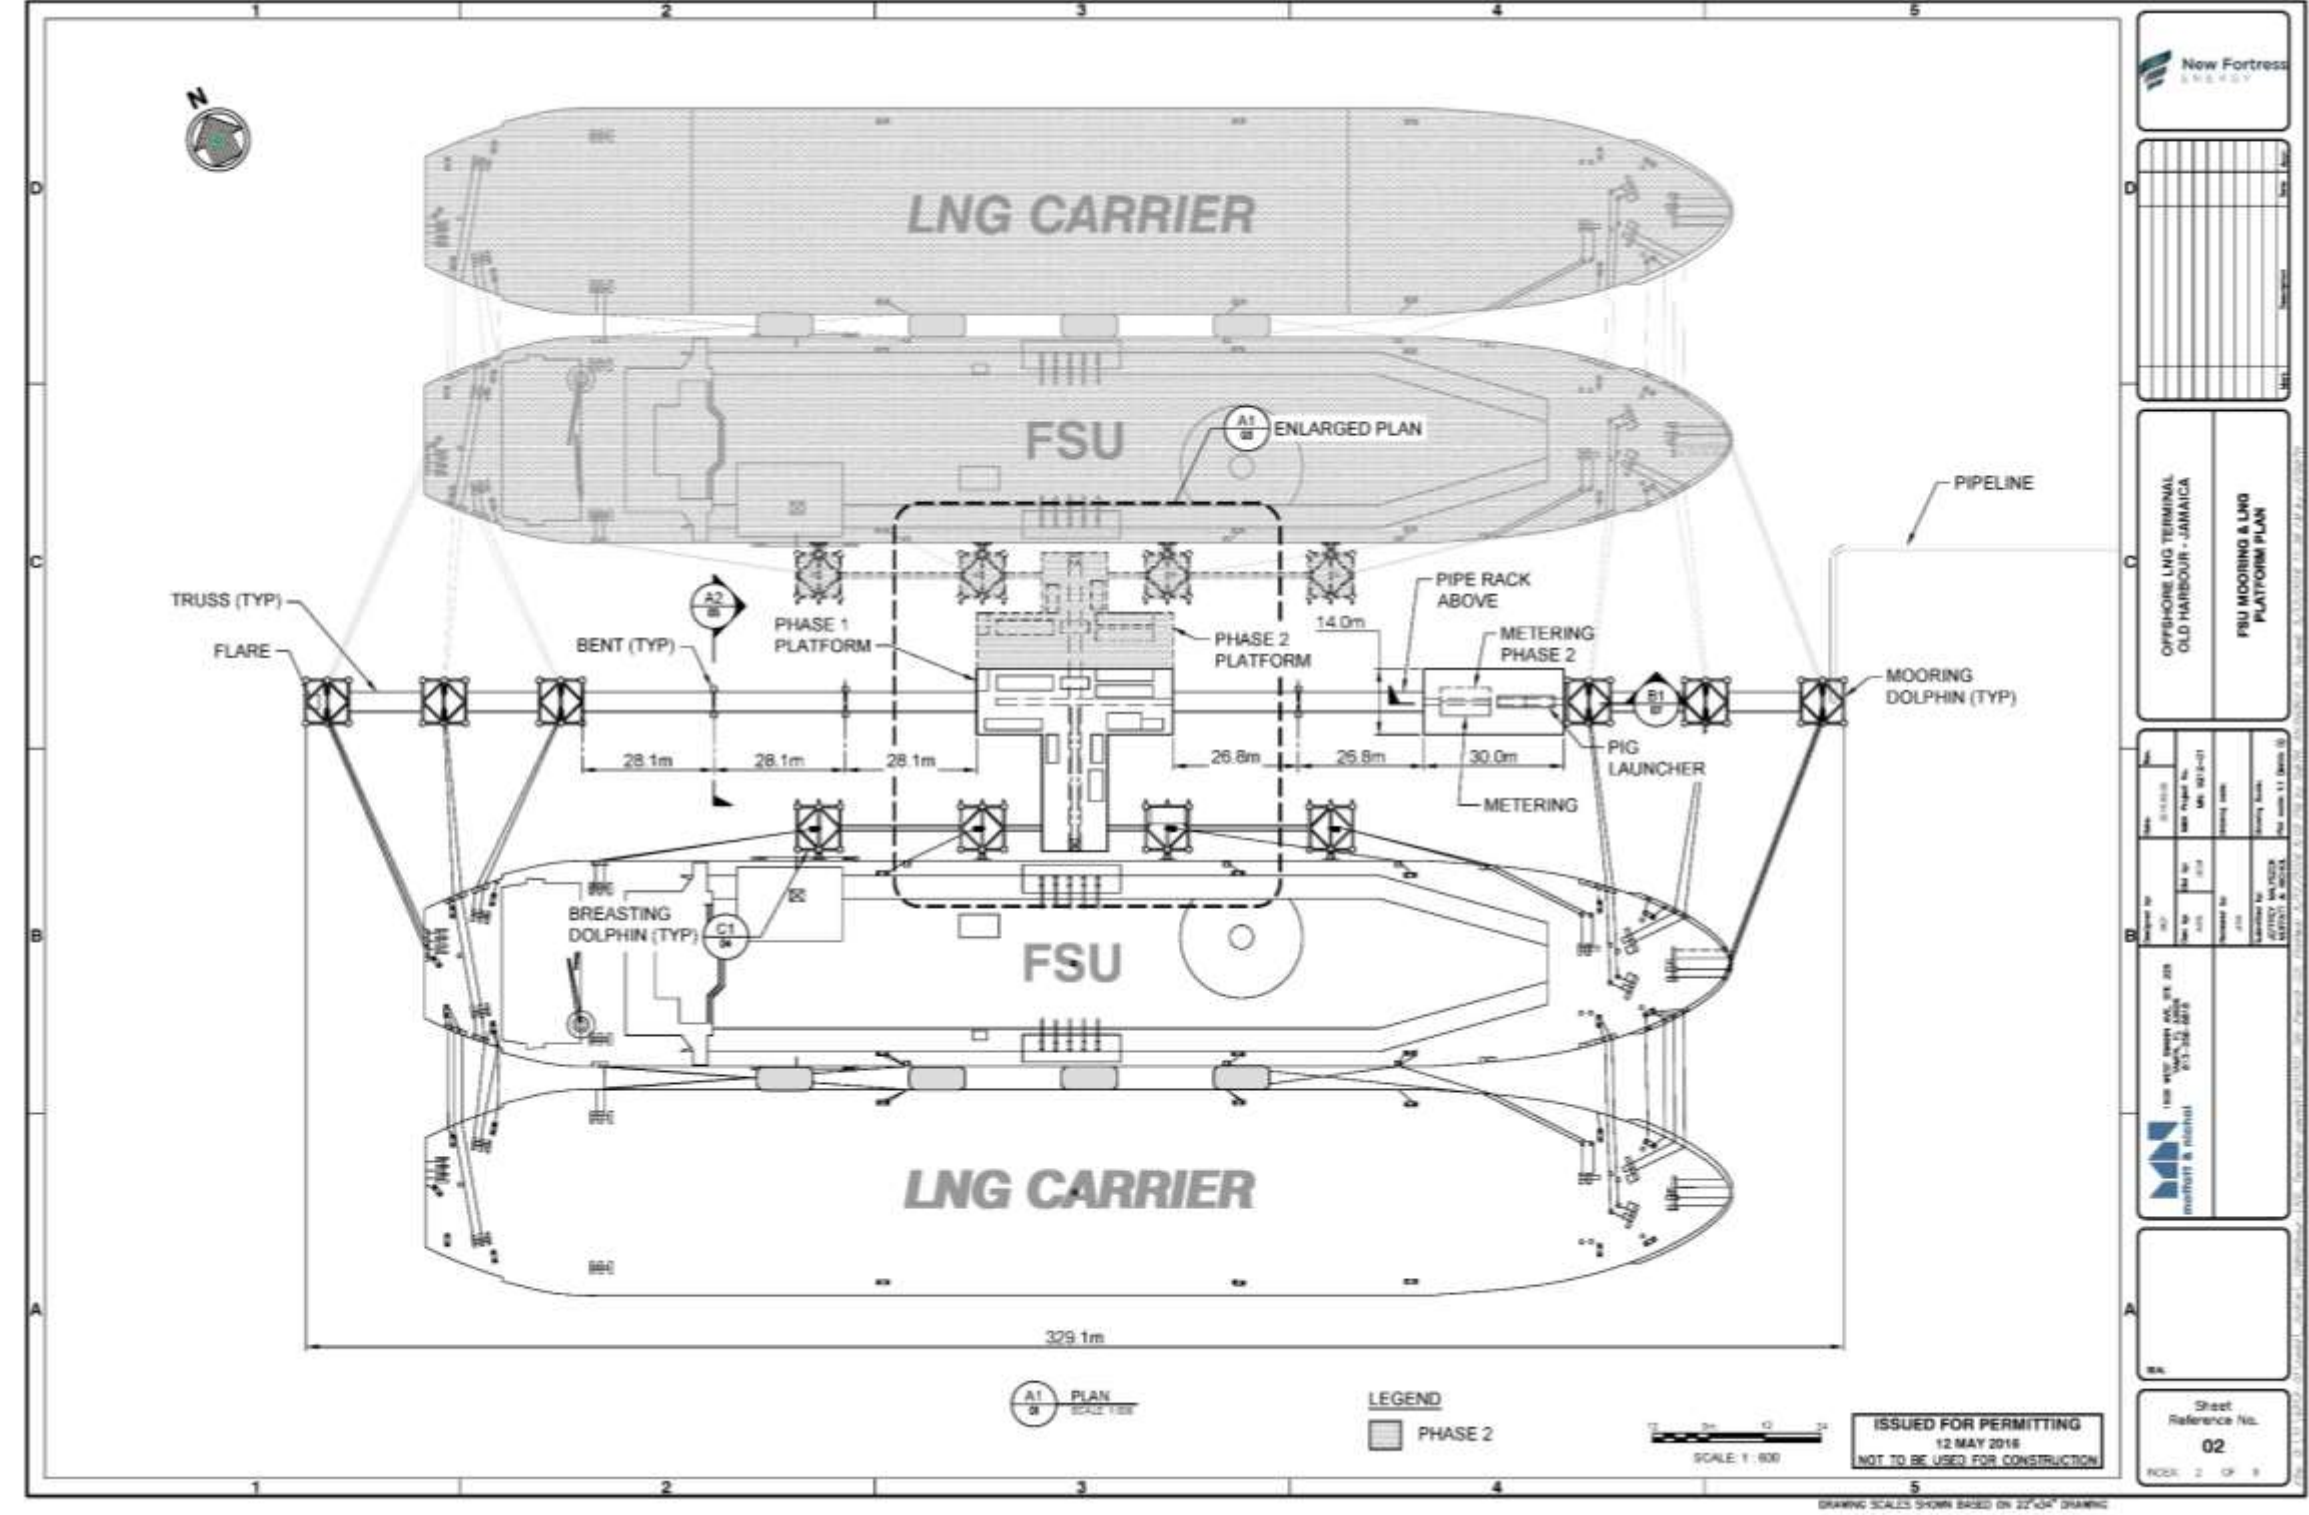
Floating Storage Unit (FSU) mooring and LNG platform plan
